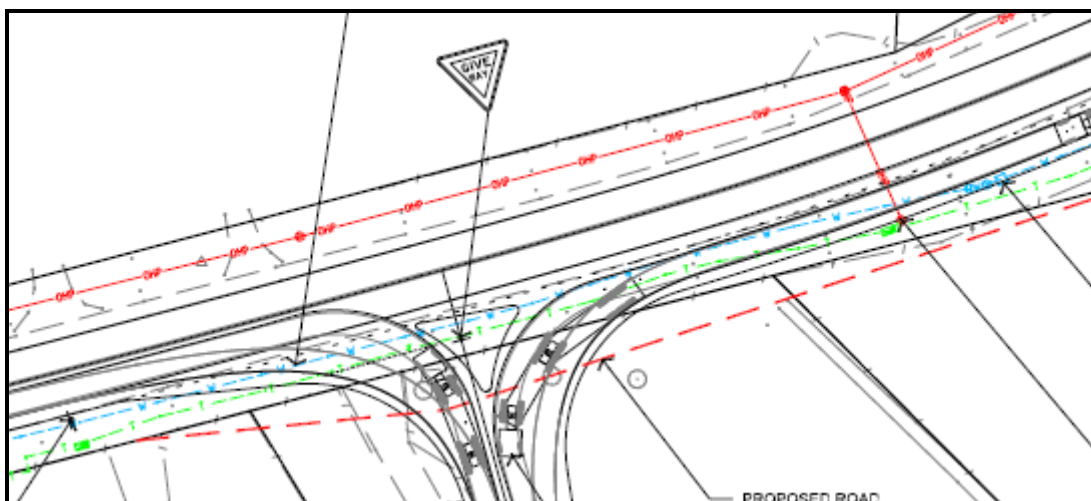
EXTRACT FROM ADJUSTED CONCEPT PLAN
